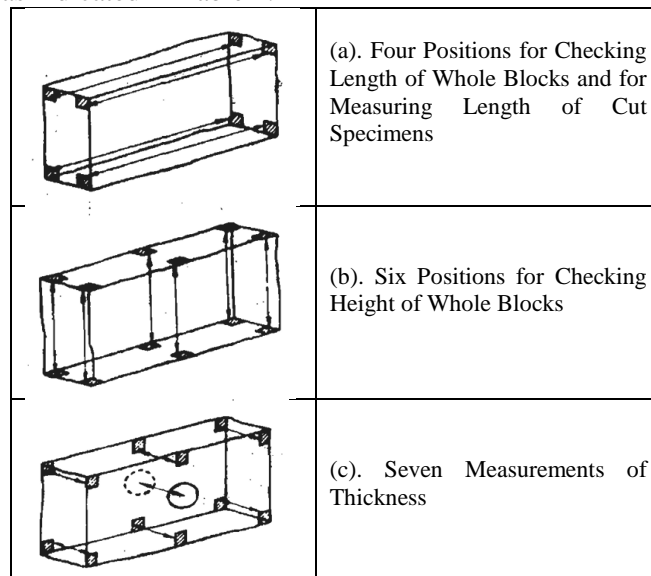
CHECKING AND MEASURING DIMENSIONS OF BLOCKS
